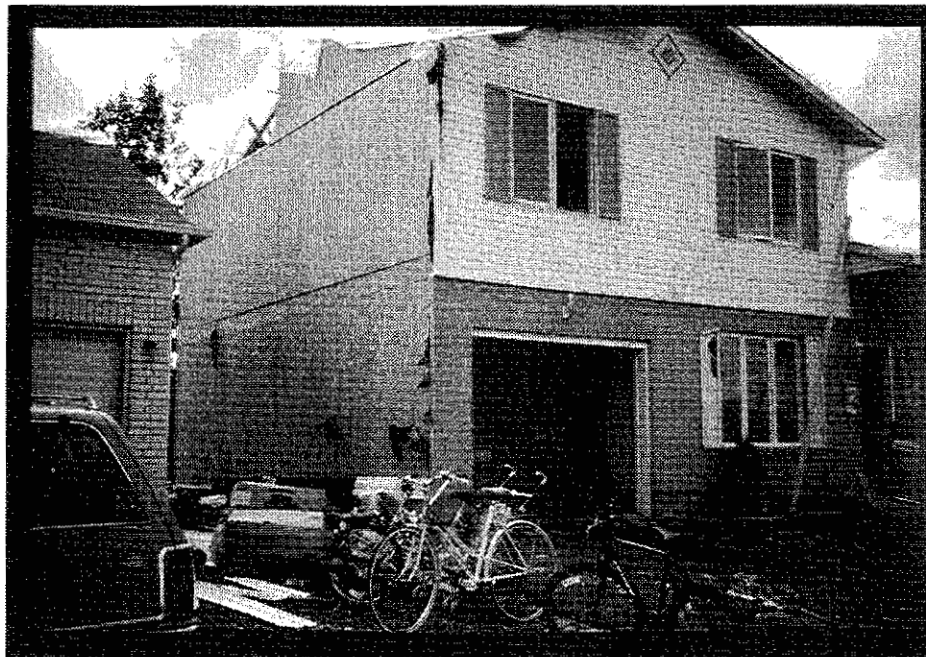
Siding stripped off south wall, roughly parallel to tornado path, with insulation splattered on east (leeward) wall.
